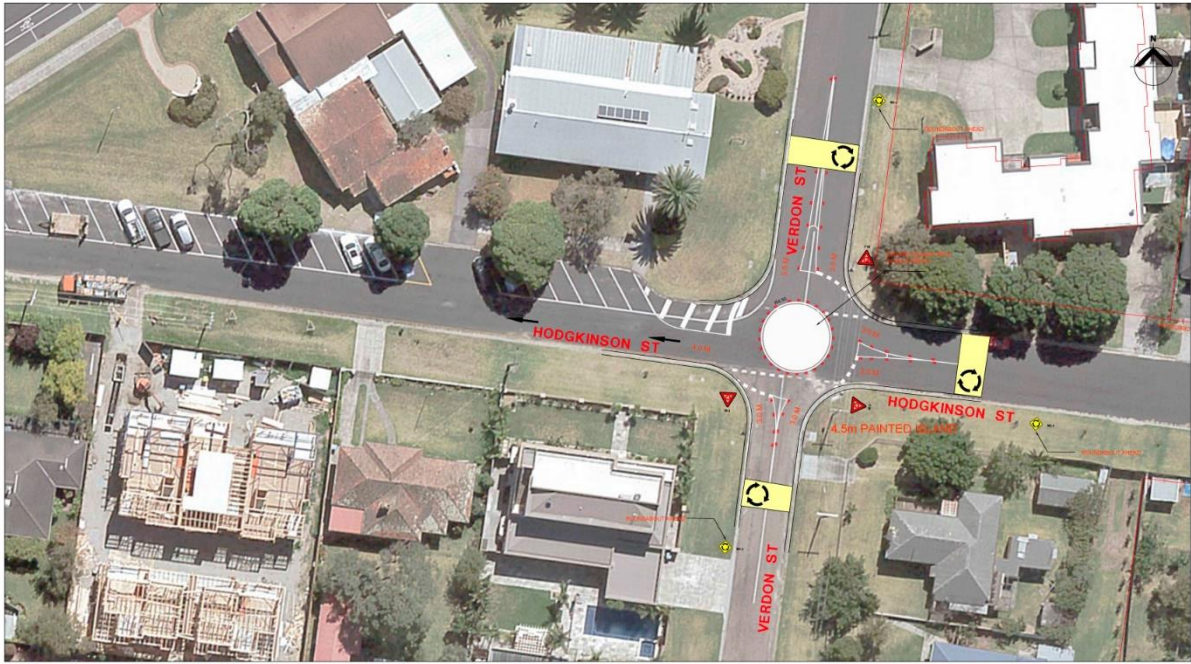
(f). Proposed compact roundabout for local residential road intersection, type 3.
